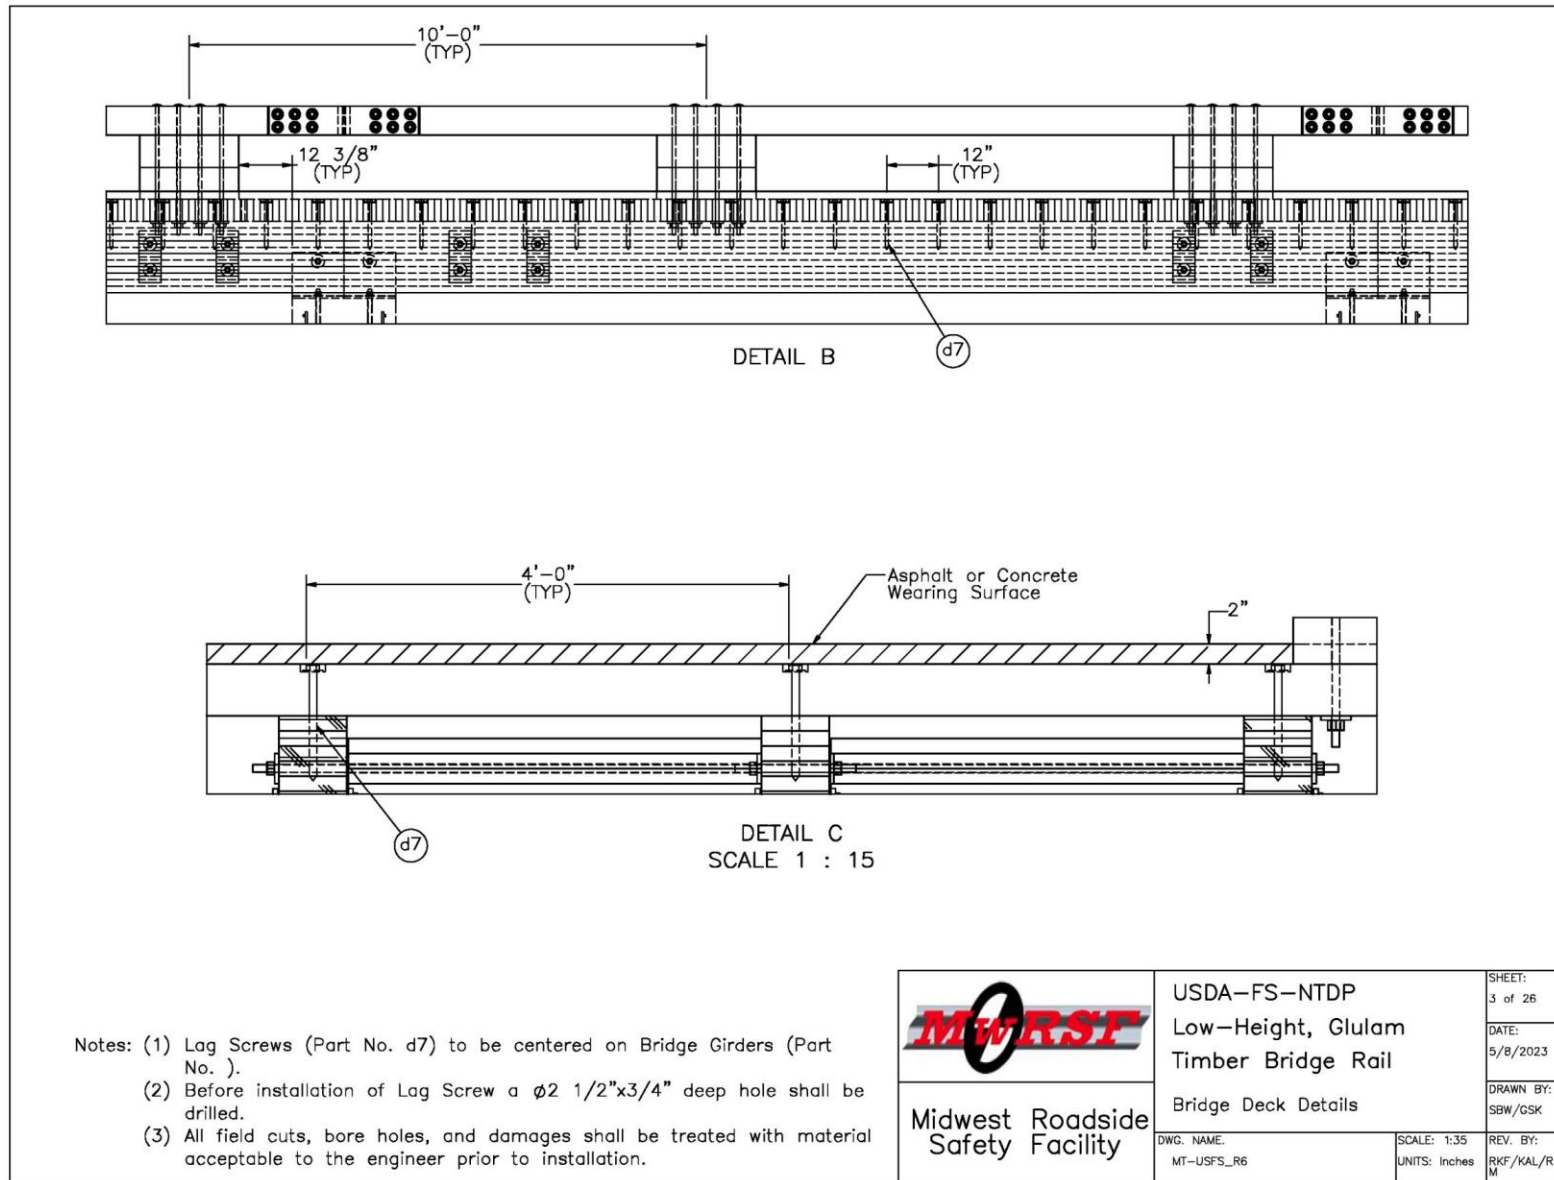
USDA-FS-NTDP Low-Height, Glulam Timber Bridge Rail: Bridge Deck Details
